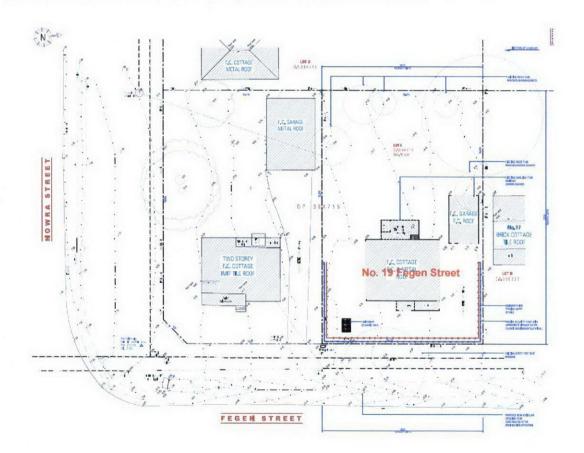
Existing site plan No. 19 Fegen Street, Huskisson.
